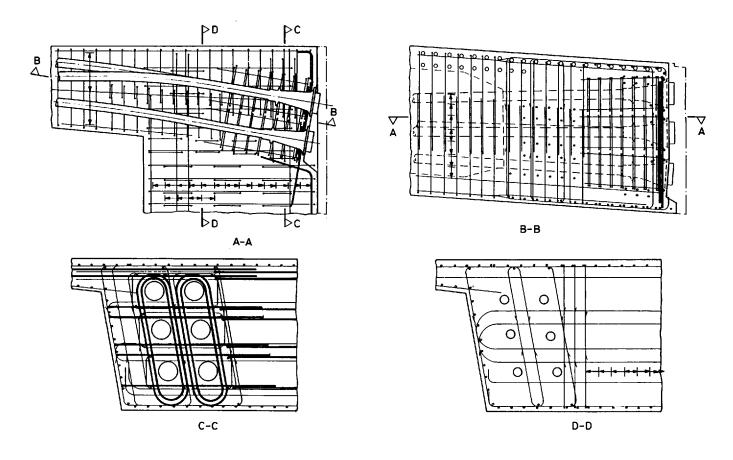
Post-tensioned end block - spalling reinforcement
